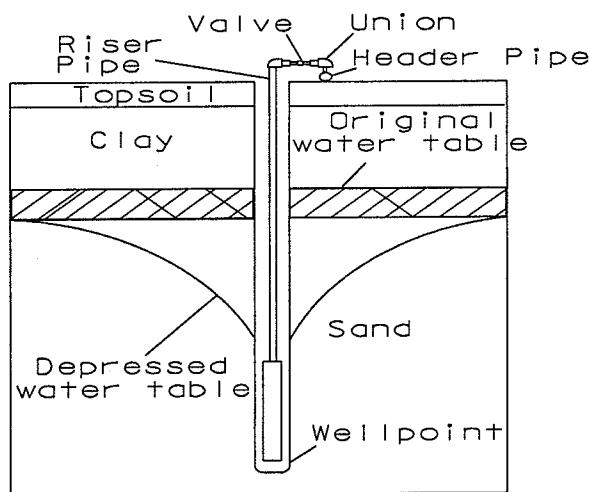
Lowering Water Table by Dewatering (Wellpoints)
